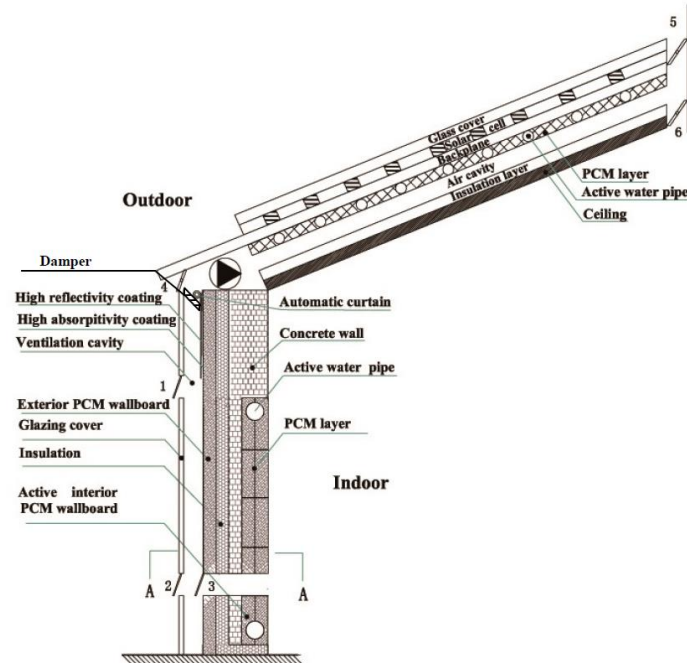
Detailed construction of a water-based PV/T-PCM module installed on a house roof for enhanced ceiling ventilation integrated with a PCM-ventilated Trombe wall [119]
